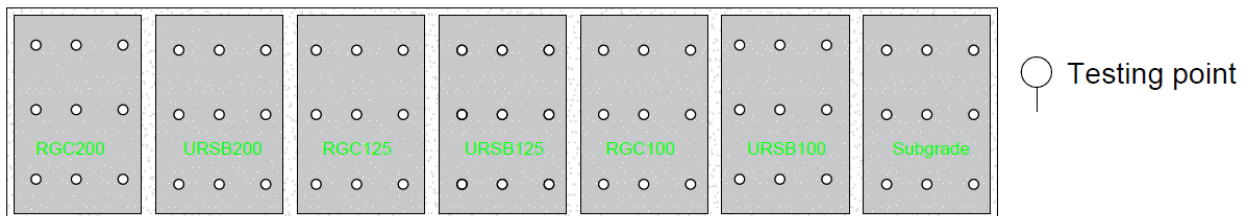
Cross Section and Instrumentation of the stretch at Testing Site for both unreinforced and reinforced Section
